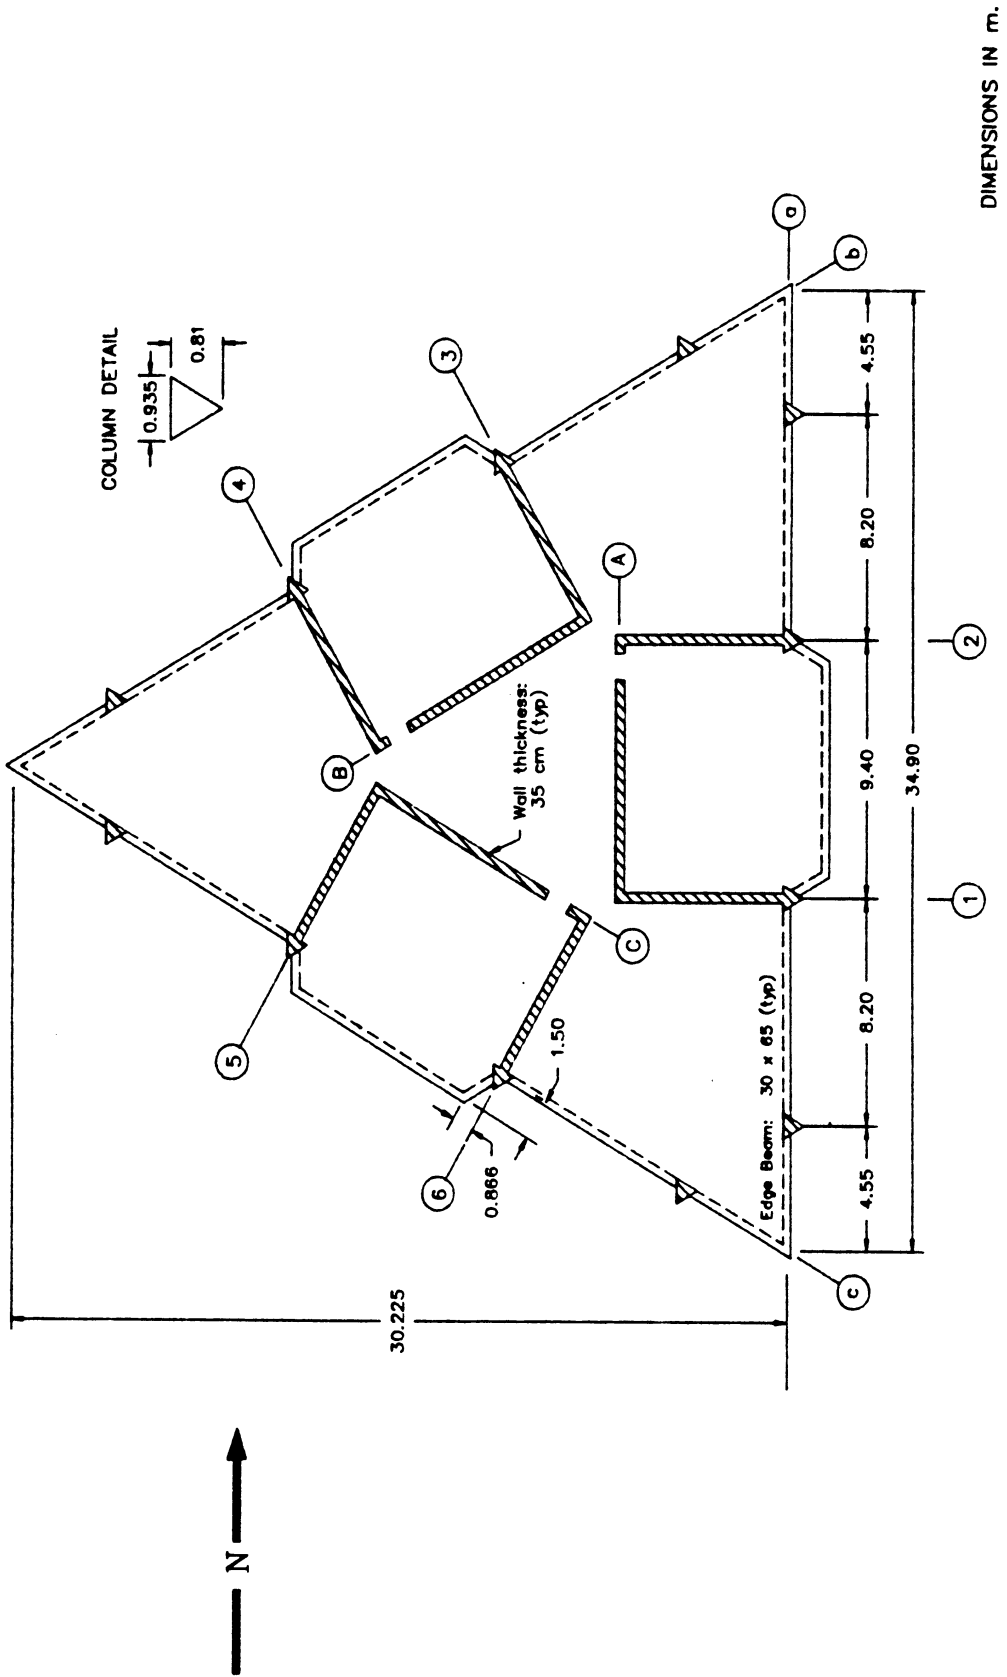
(a) : Plan View of a Typical Story of Miramar Building.
